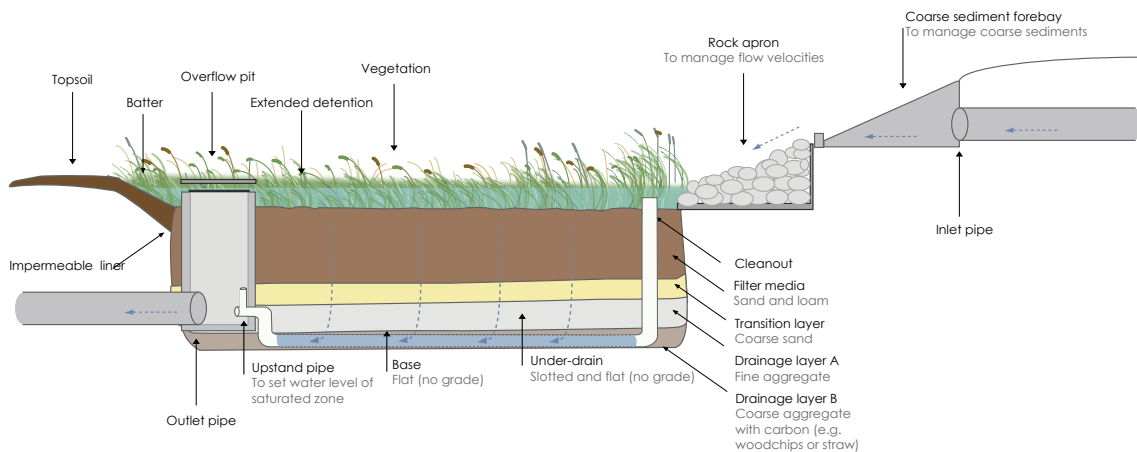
Typical cross-section of a bioretention system with a saturated zone.
